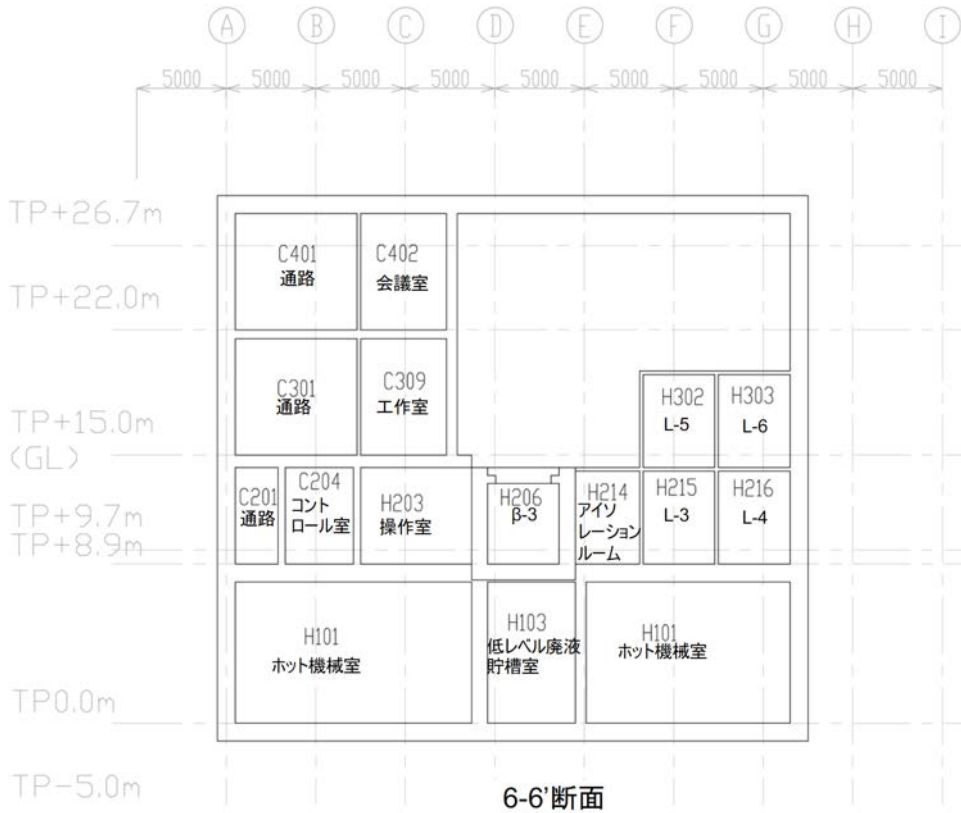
Elevation view of PIE facility (6-6').
